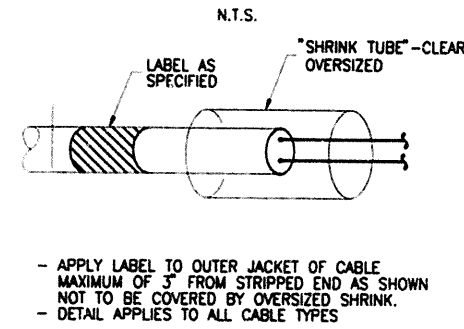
DETAIL "B" - TYPICAL CABLE LABELING METHOD
